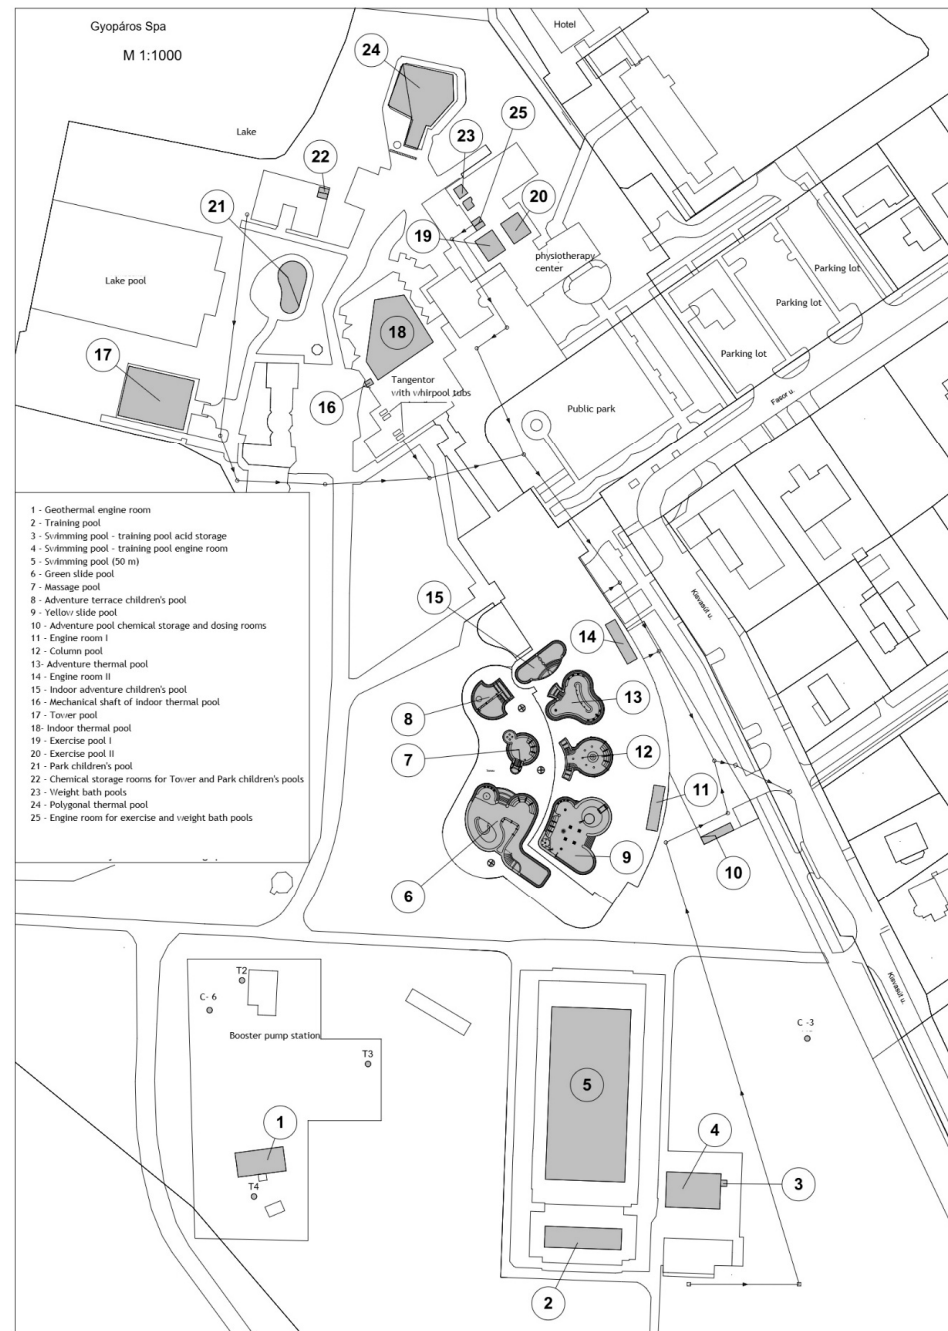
Gyopáros Spa site plan with pools and mechanical rooms.
